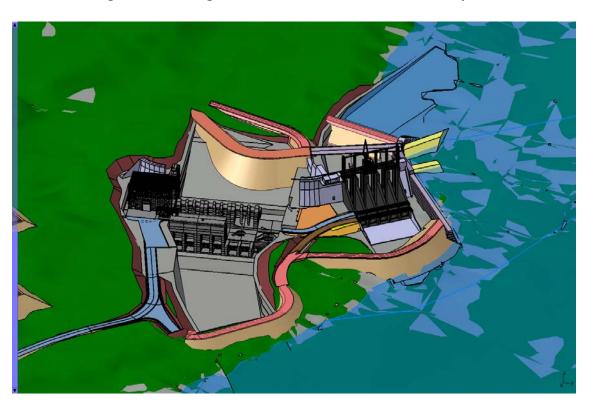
Stage 1 – Pre-Diversion Construction Completed
